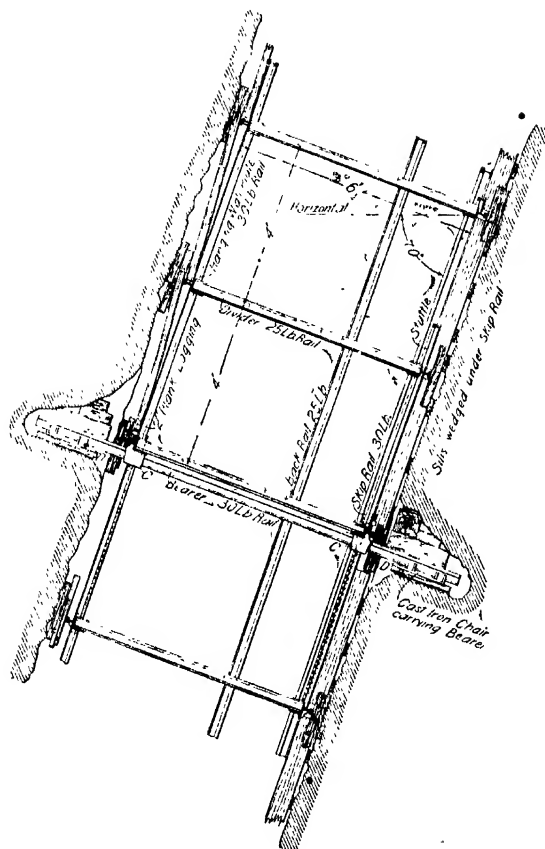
End elevation showing four successive frames in an inclined shaft, and also one of the 'bearers'
